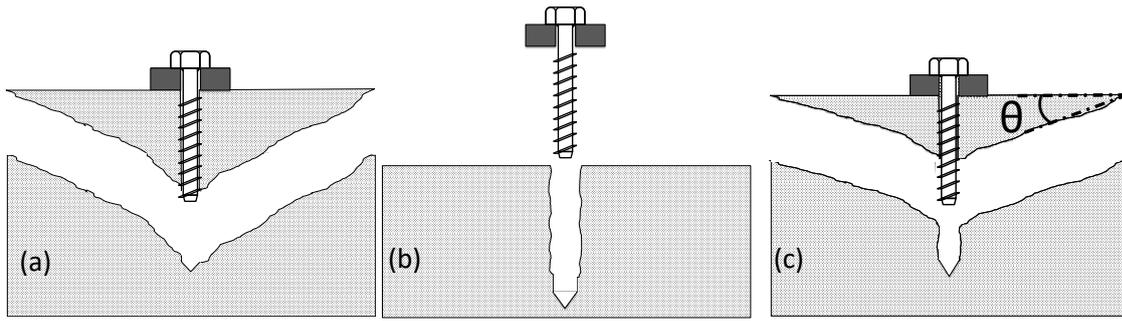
Screw anchor common failure modes under tensile load (a) concrete cone failure, (b) pull-out failure, (c) combined pull-out and cone failure
